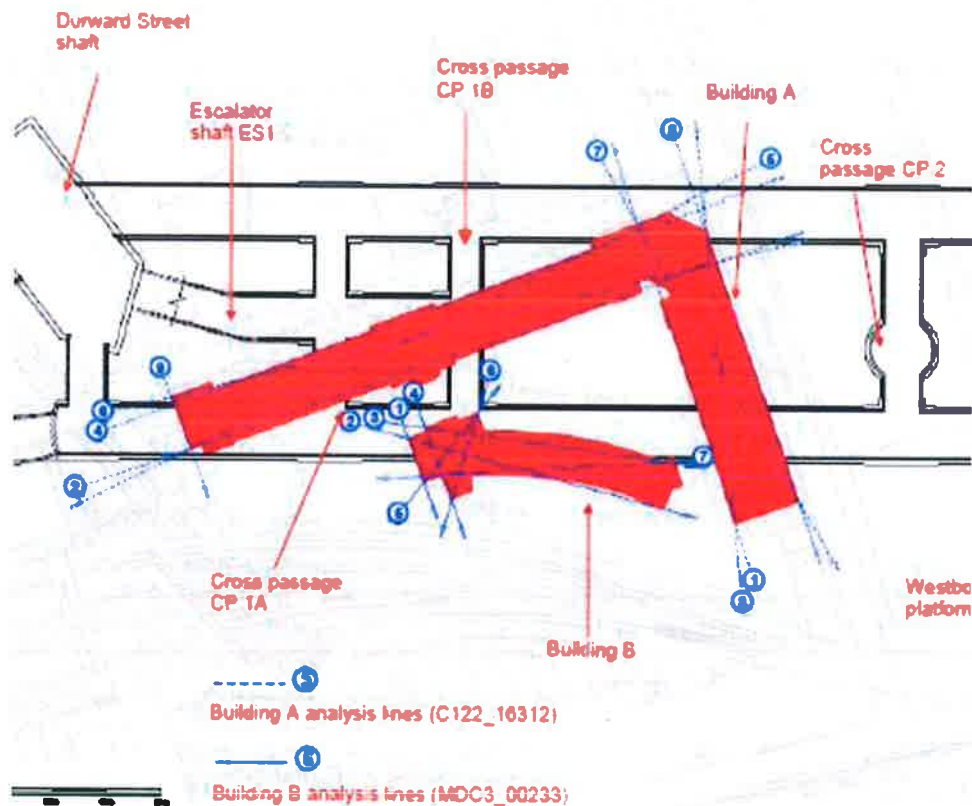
Kempton Court Building A and Building B location relative to tunnel plan [1]
